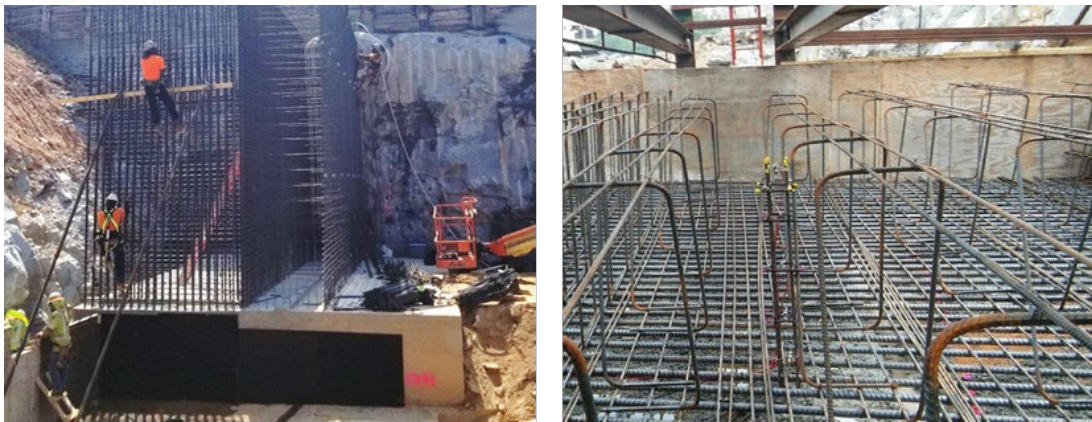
Photos. Concrete foundation of the SR-92 bridge.
